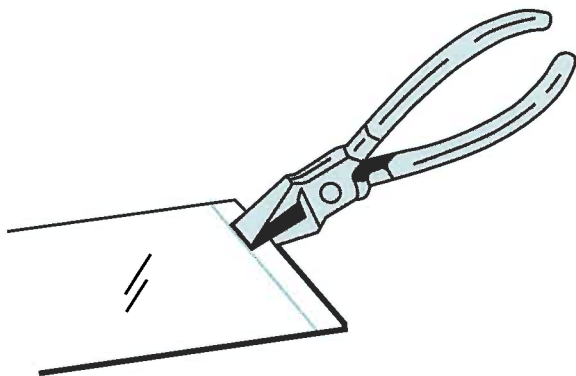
Pliers are used to remove small chips that cannot be fractured by hand.
